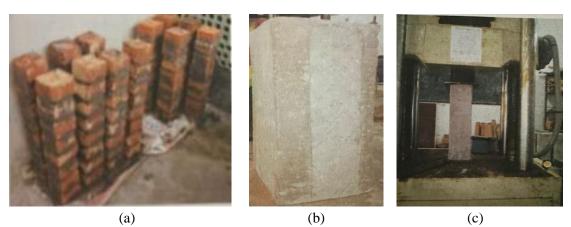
(a) Brick masonry column (b) strengthened brick masonry column and (c) experimental setup.
